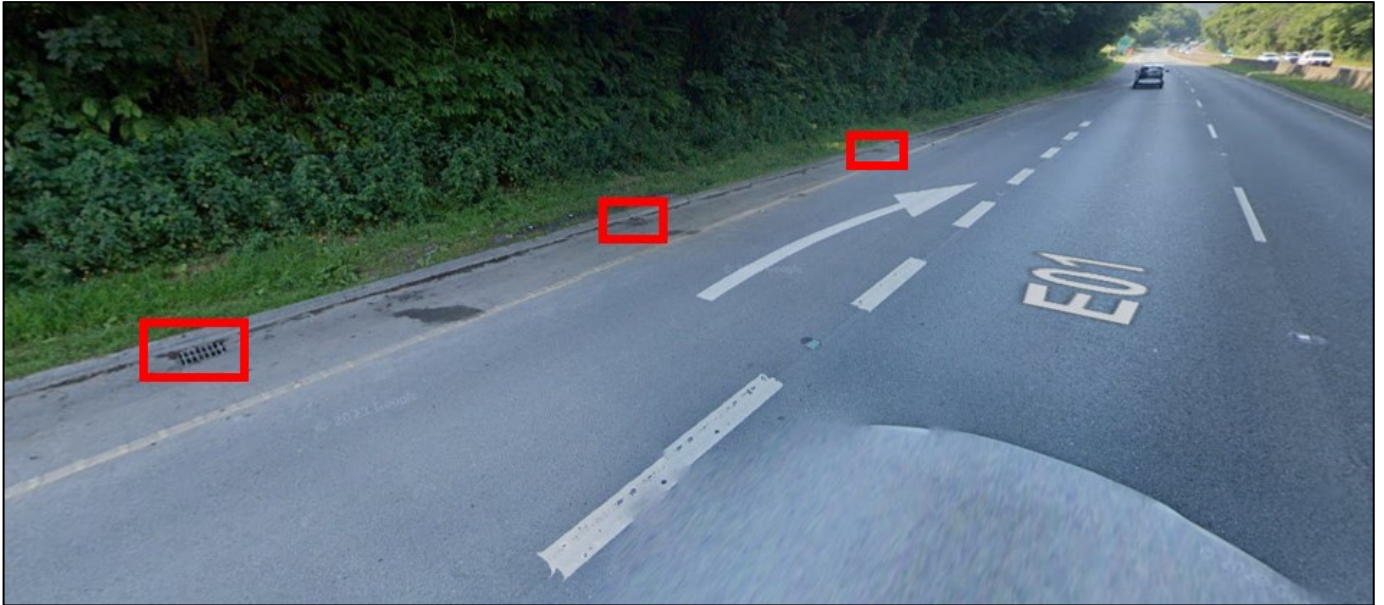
Drummin Lane – Exit of N11 Drainage system
